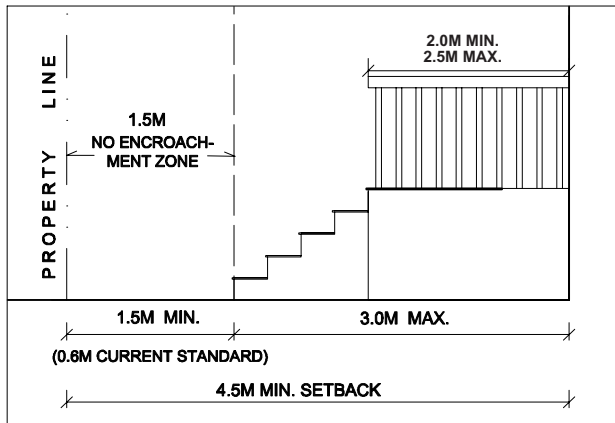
Front porches and projecting bay windows are encouraged as front yard encroachments, but must respect a 1.5 metre no encroachment zone.
